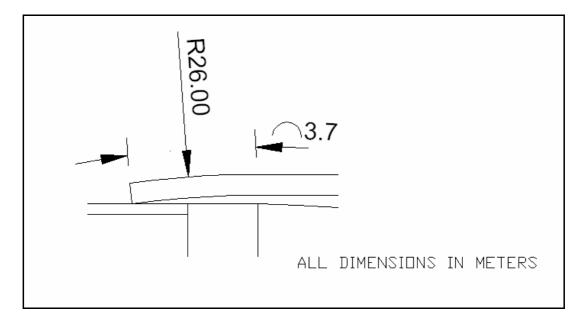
Side View Crossing Junction Switch Incoming Rails Dimensions #2
